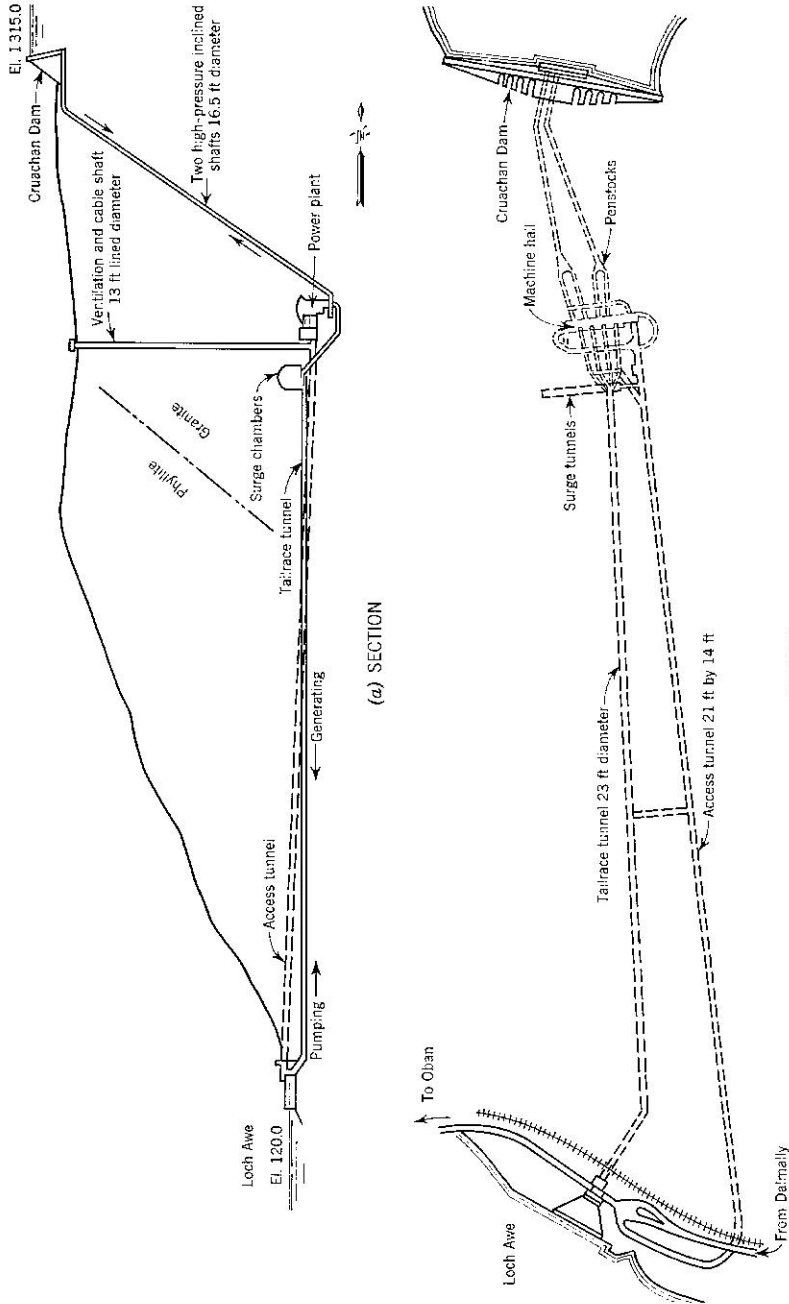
GENERAL LAYOUT OF THE CRUACHAN SCHEME
